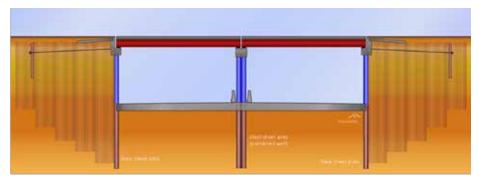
Typical section of a SSP bridge abutment and pier structure.
